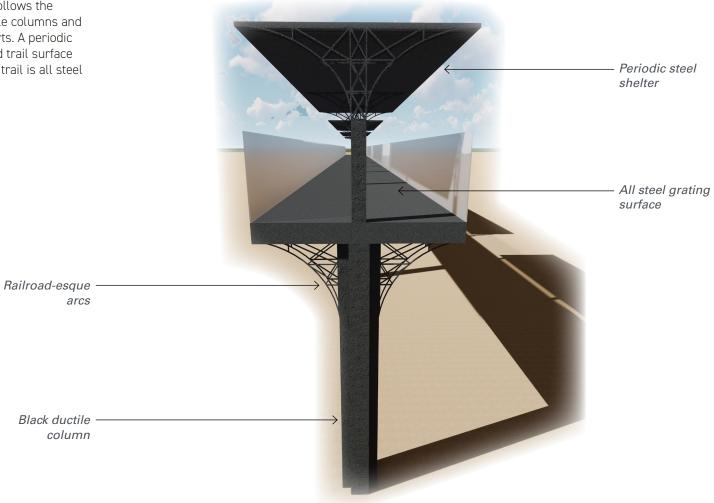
ELEVATED TRAIL CONCEPT DESIGN: RAILROAD-INSPIRED RENDERING
